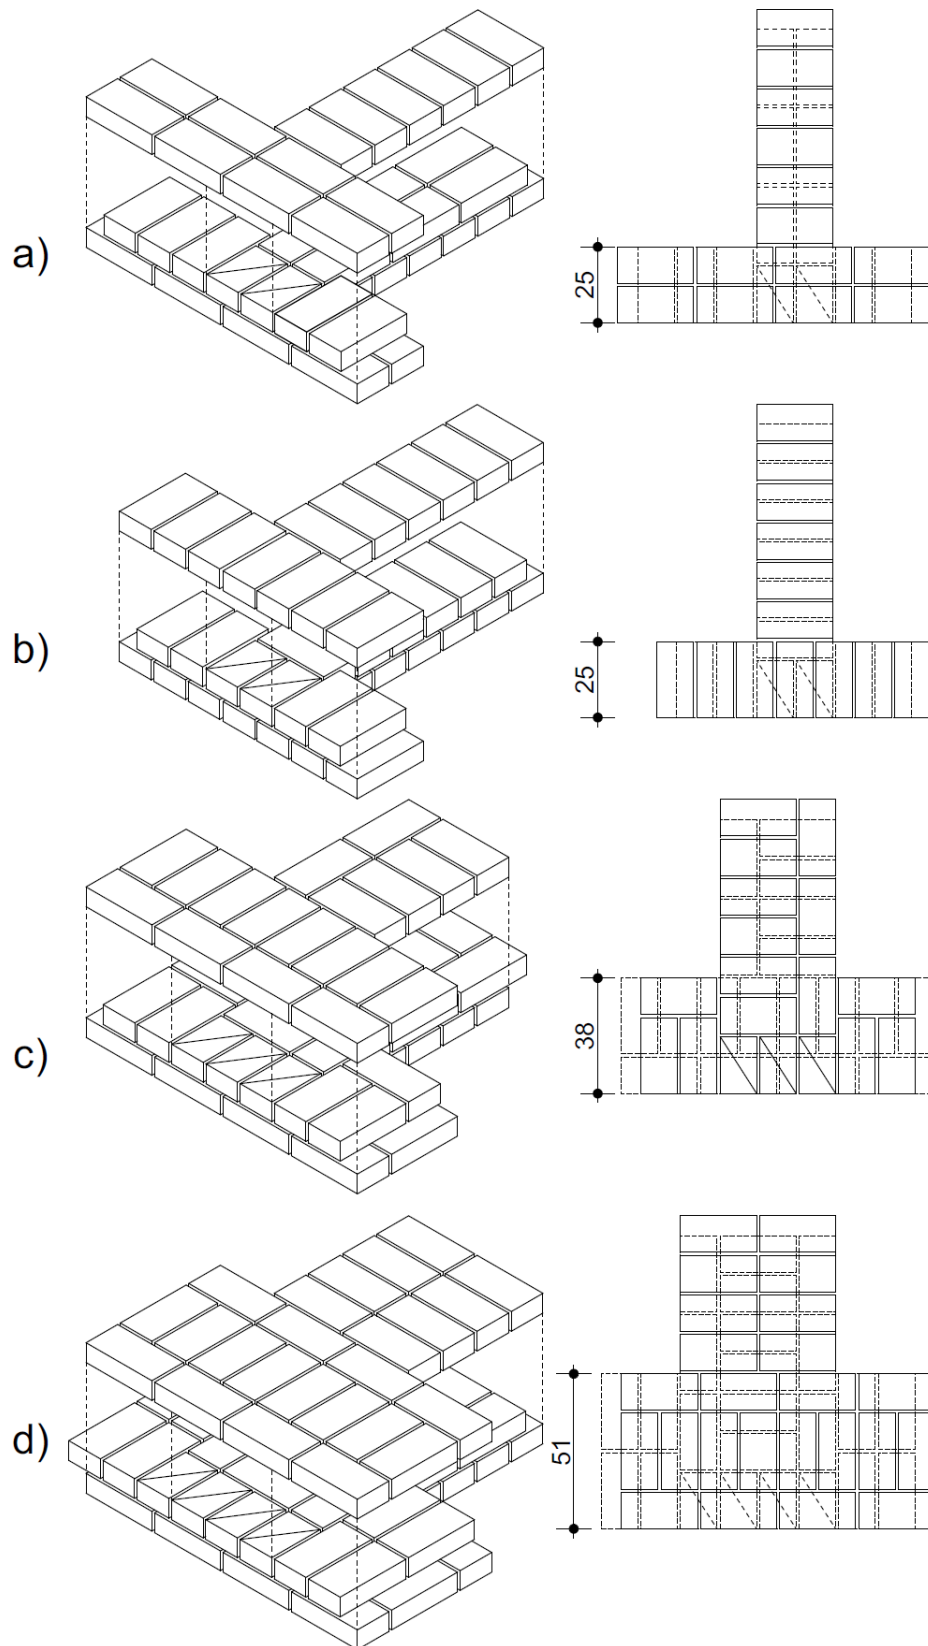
T junction: a)-b) one-brick wall header and stretcher bond, c) english bond of half-and one-brick wall, d) english bond of two-brick wall
